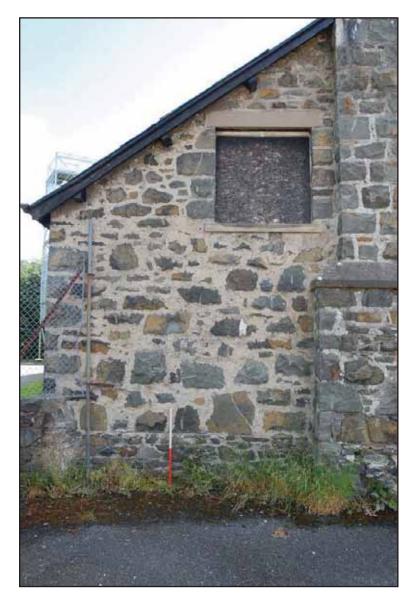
Detached north building - west elevation detail. Scale 1.0m
